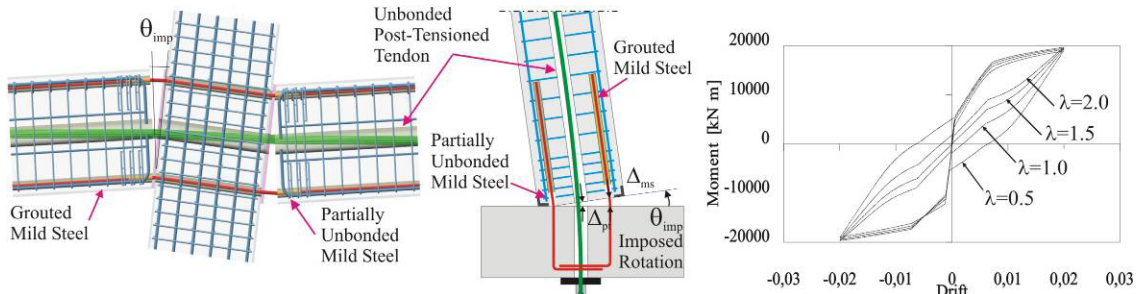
Rocking connection: Left, beam-column joint; Centre, pier/column-foundation connection; Right, cyclic behaviour as function of non-prestressed to prestressed moment ratio (λ).
